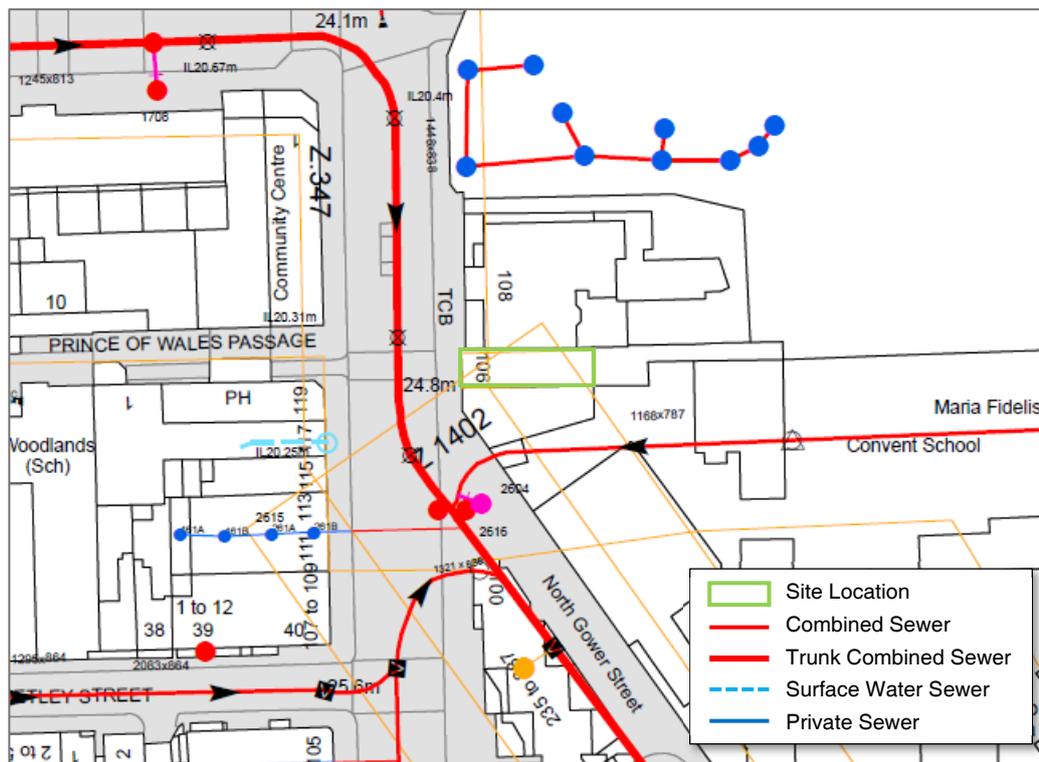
Asset location mapping provide by Thames Water (a full scale can be found in Appendix A.2).
